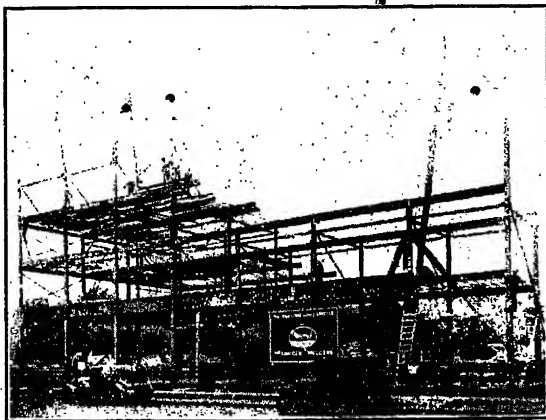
SHOWS FRAMING PARTLY ERECTED WITH 36-IN. GIRDER WELDED IN POSITION
